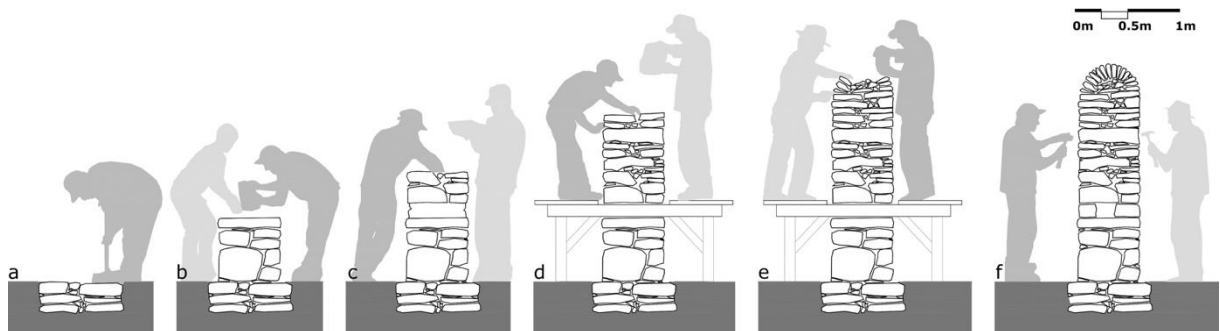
Different construction stages of a vernacular high farm wall: (a) foundation; b - placing a bondstone connecting both faces of the masonry wall); (c) construction until 1.2 m high, with openings to support the timber scaffold; (d) construction using a timber scaffold; (e) cap building; (f) pointing of masonry joints and scaffold's support opening.
